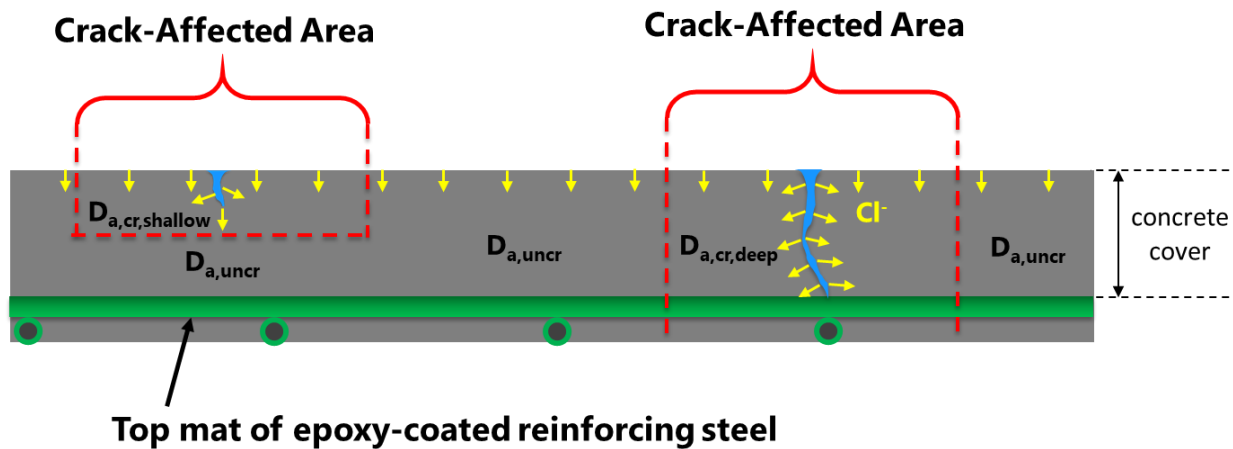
Schematic showing how cracks facilitate higher rates of chloride ion transport through the concrete cover. Uncracked concrete has a chloride diffusion coefficient of $D_{a,un-cr}$ while concrete within the crack-affected areas has greater diffusion coefficients $D_{a,cr,shallow}$ if the crack is shallow and $D_{a,cr,deep}$ if the crack is deep. The yellow arrows show the direction of chloride ingress.
